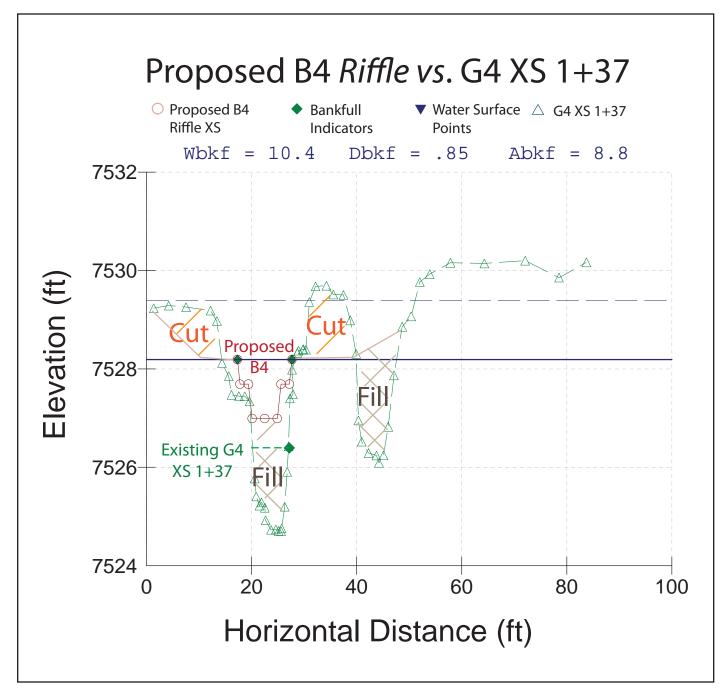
The proposed B4 *riffle* cross-section compared to the existing G4 cross-section 1+37, indicating the cut and fill requirements and new bankfull elevation.
